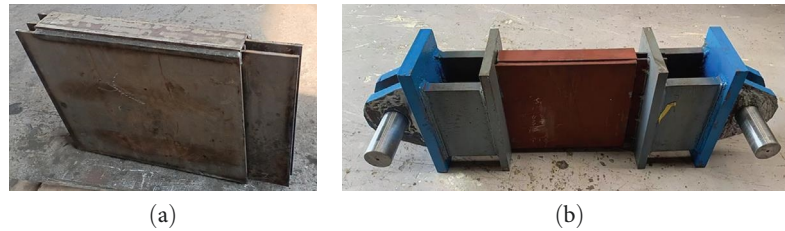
Manufactured specimen: (a) before welding the connectors and (b) after welding the connectors.
